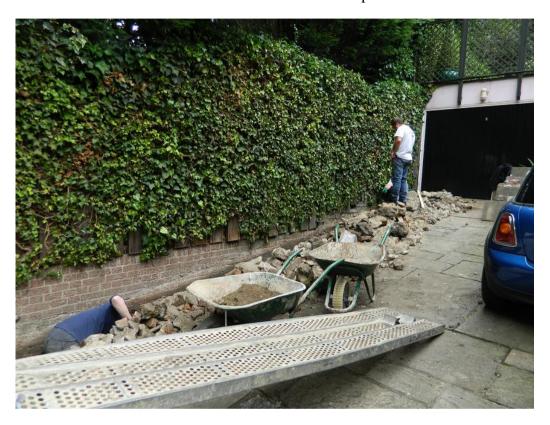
Root thought to be from the neighbour's cypress growing along face of boundary wall foundations.
